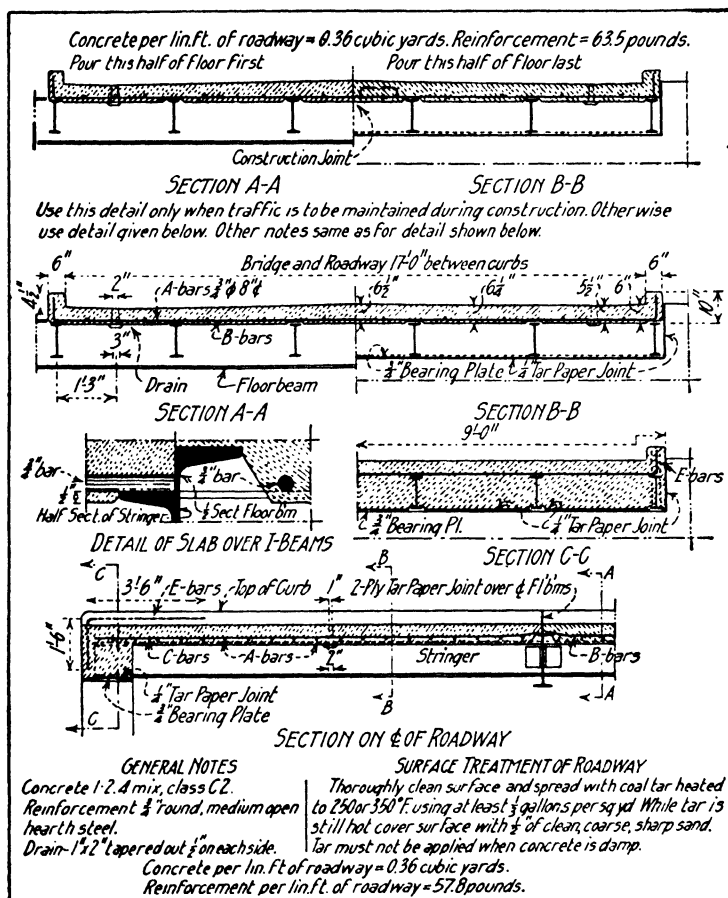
REINFORCED CONCRETE FLOOR, MICHIGAN HIGHWAY COMMISSION.
